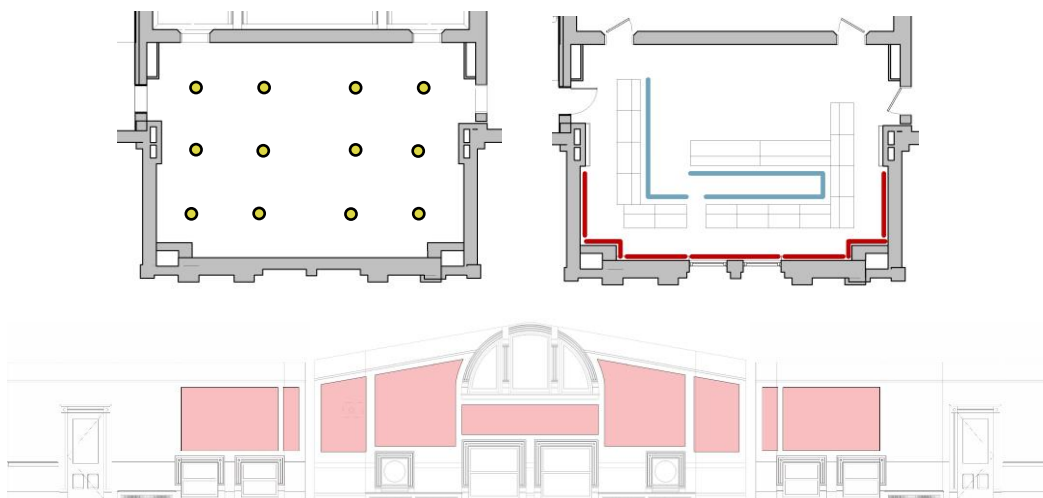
a - Floor Plan, Reflected Ceiling Plan, and Elevations of JAC
